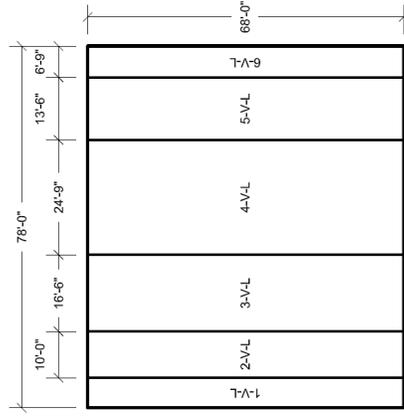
H.6-59: PUMP HOUSE EAST WALL LOOKING WEST
